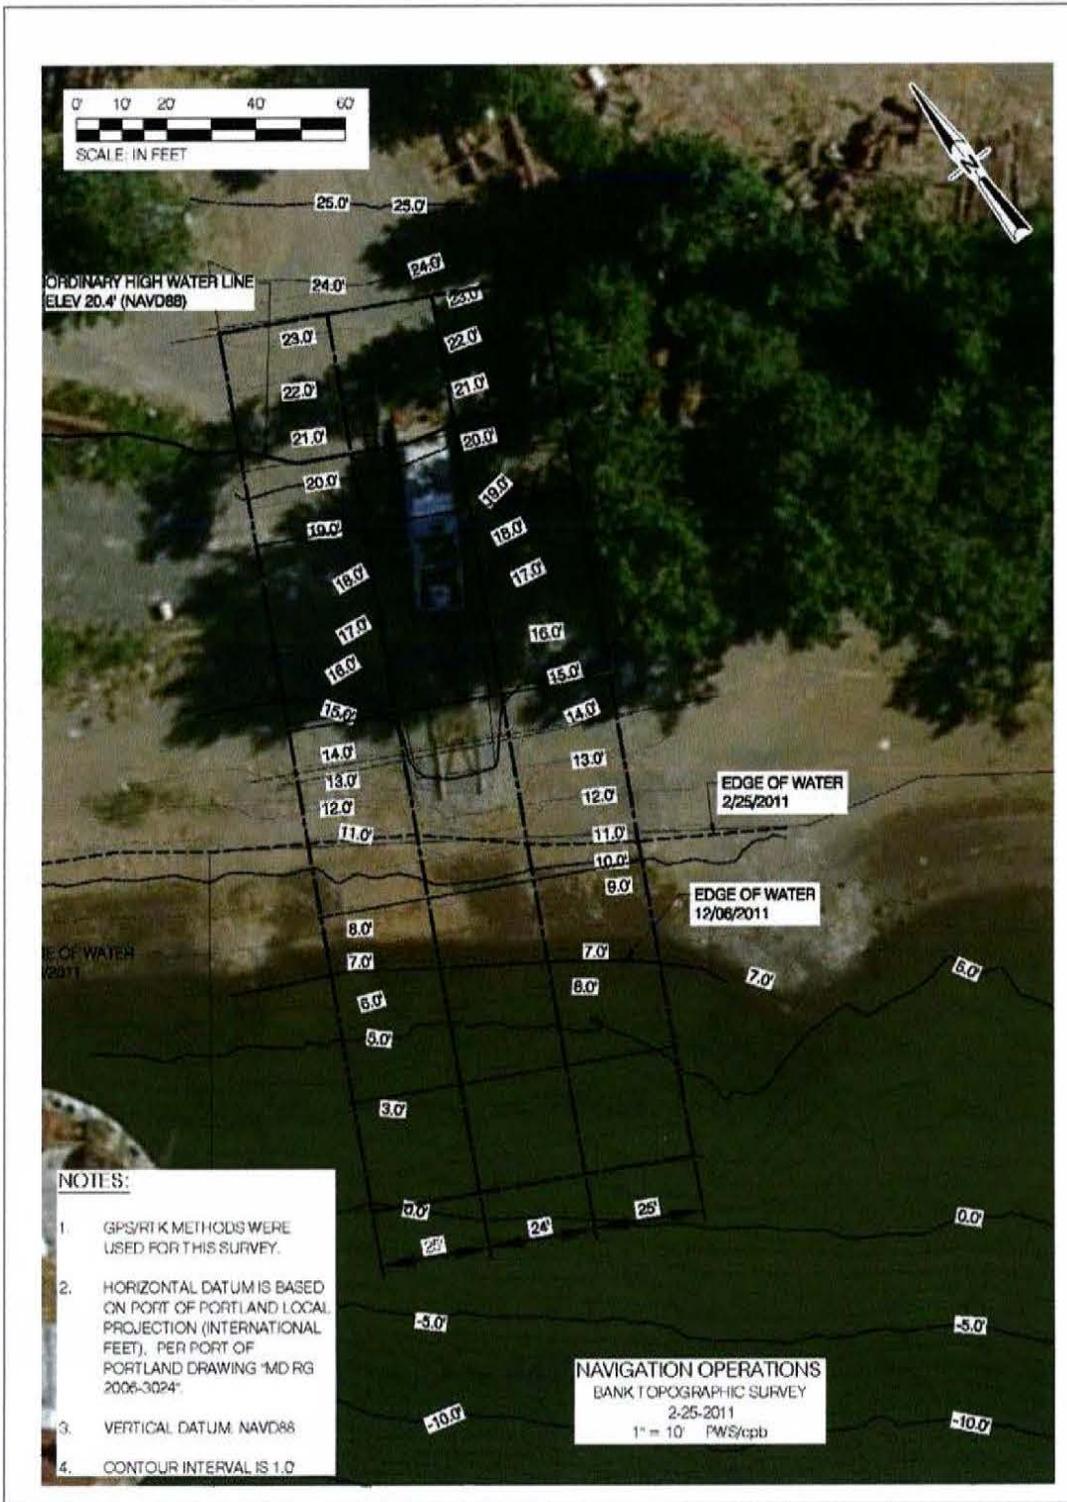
Plan view drawing of the proposed Port Navigation Shore Ramp Project.
